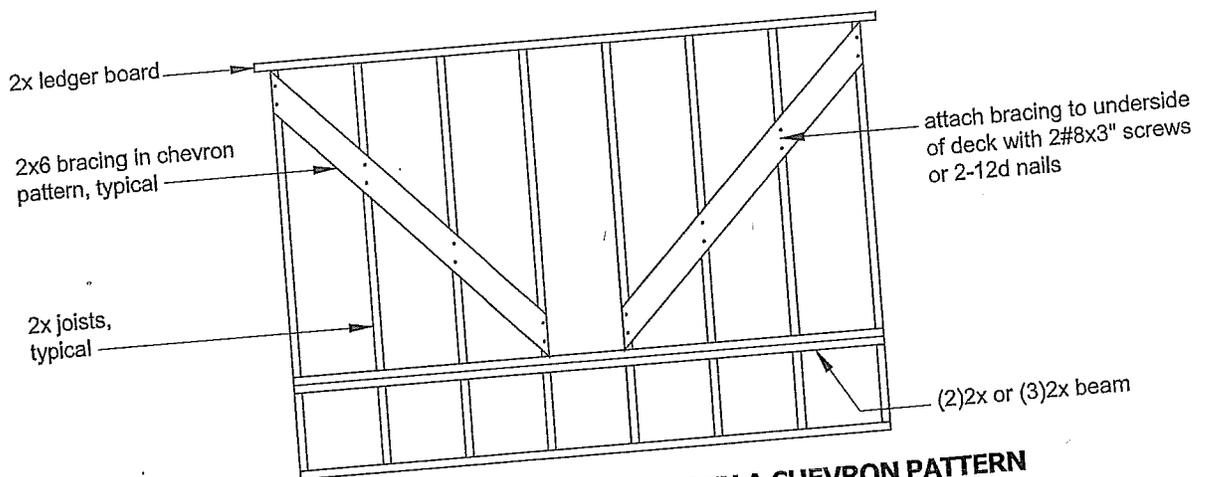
HORIZONTAL BRACING IN A CHEVRON PATTERN
